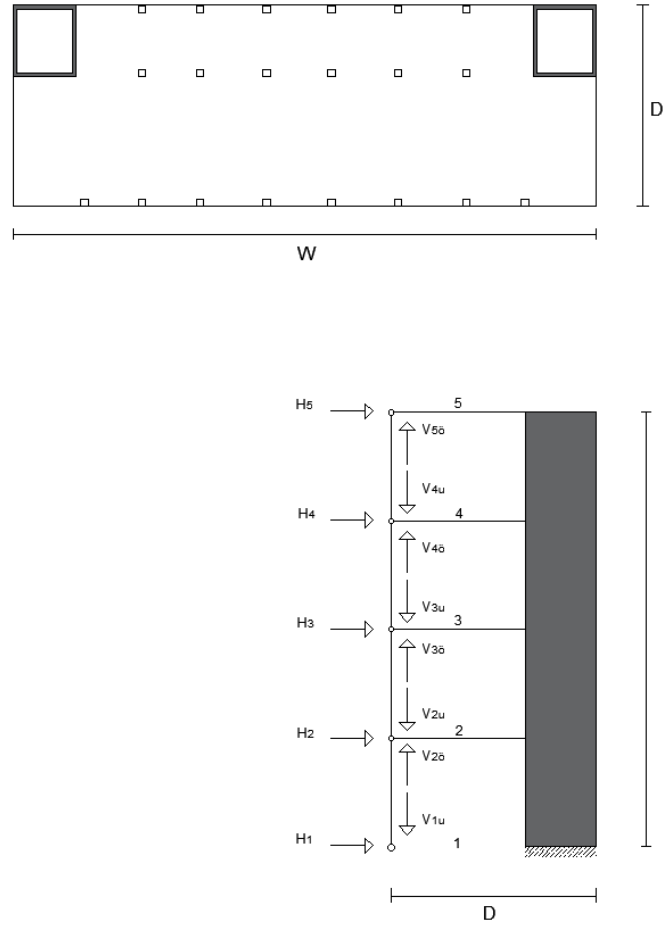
Plan view and horizontal section of example building. The two squares are stabilising cores.
